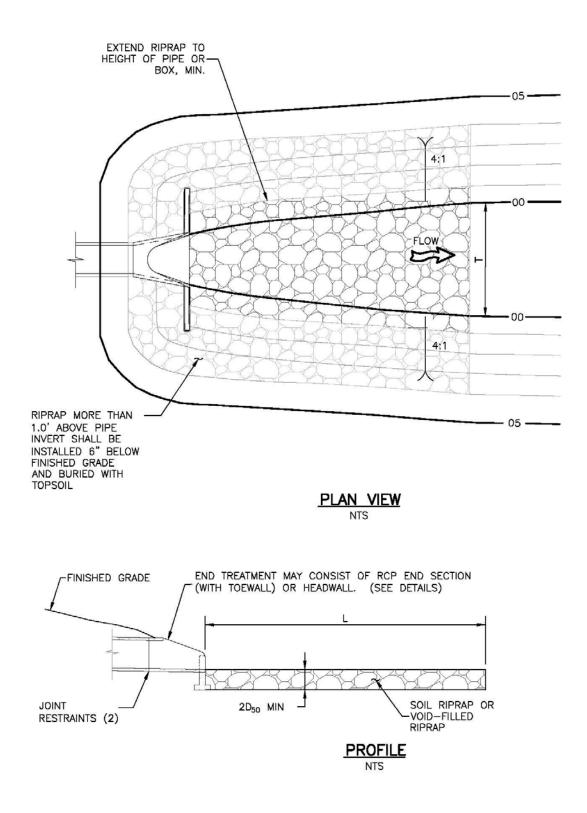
Riprap apron detail for culverts in-line with the channel
